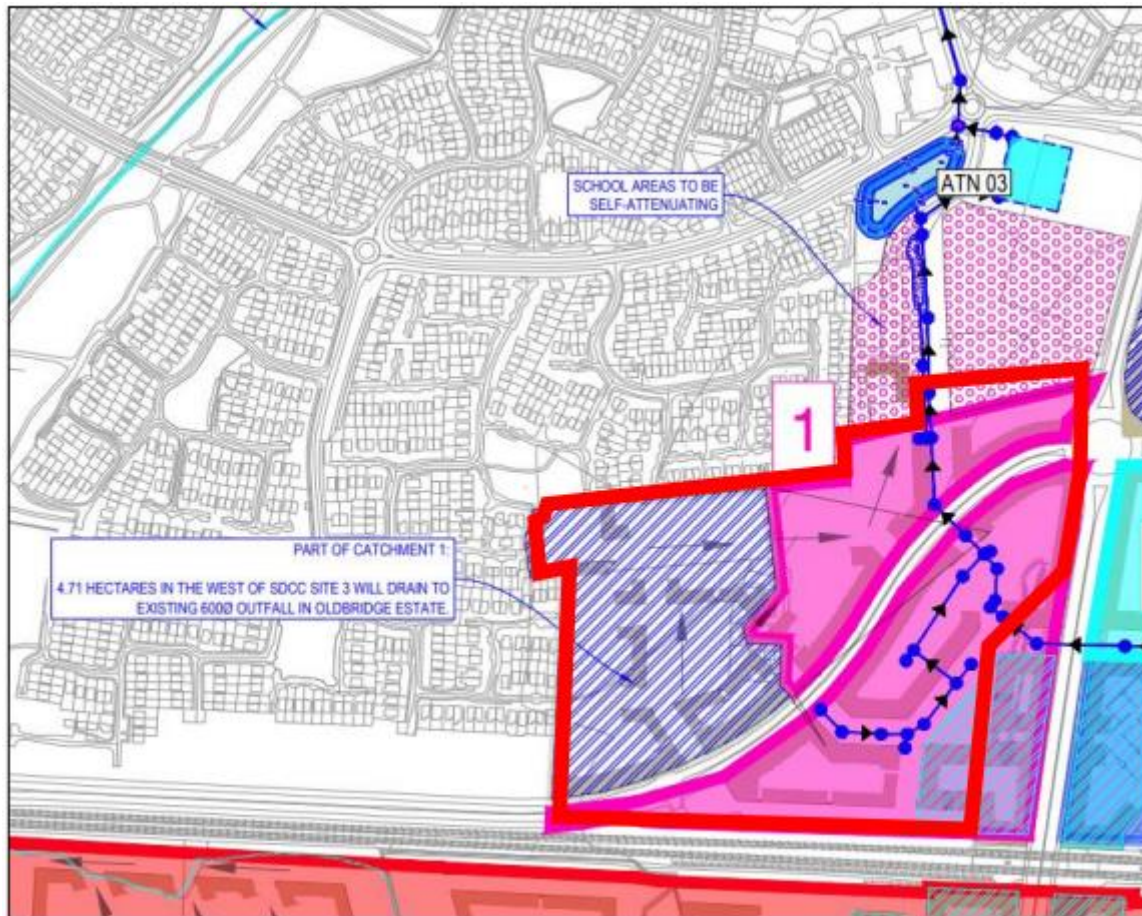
Kishoge Site 3 – surface water sub-catchment and outfalls
